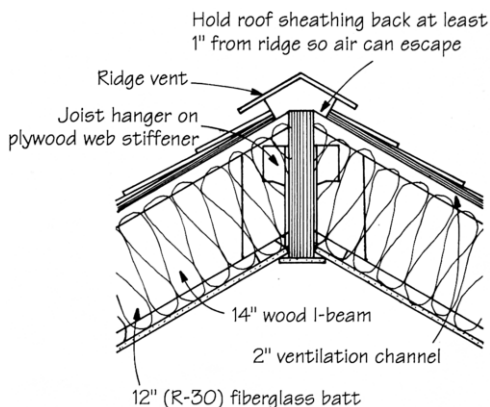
Wood I-beams are generally deeper than conventional solid-sawn rafters, so you can get good insulation and still leave ample room for ventilation. Use full-width batts so the insulation will fit tight next to the narrow webs.
